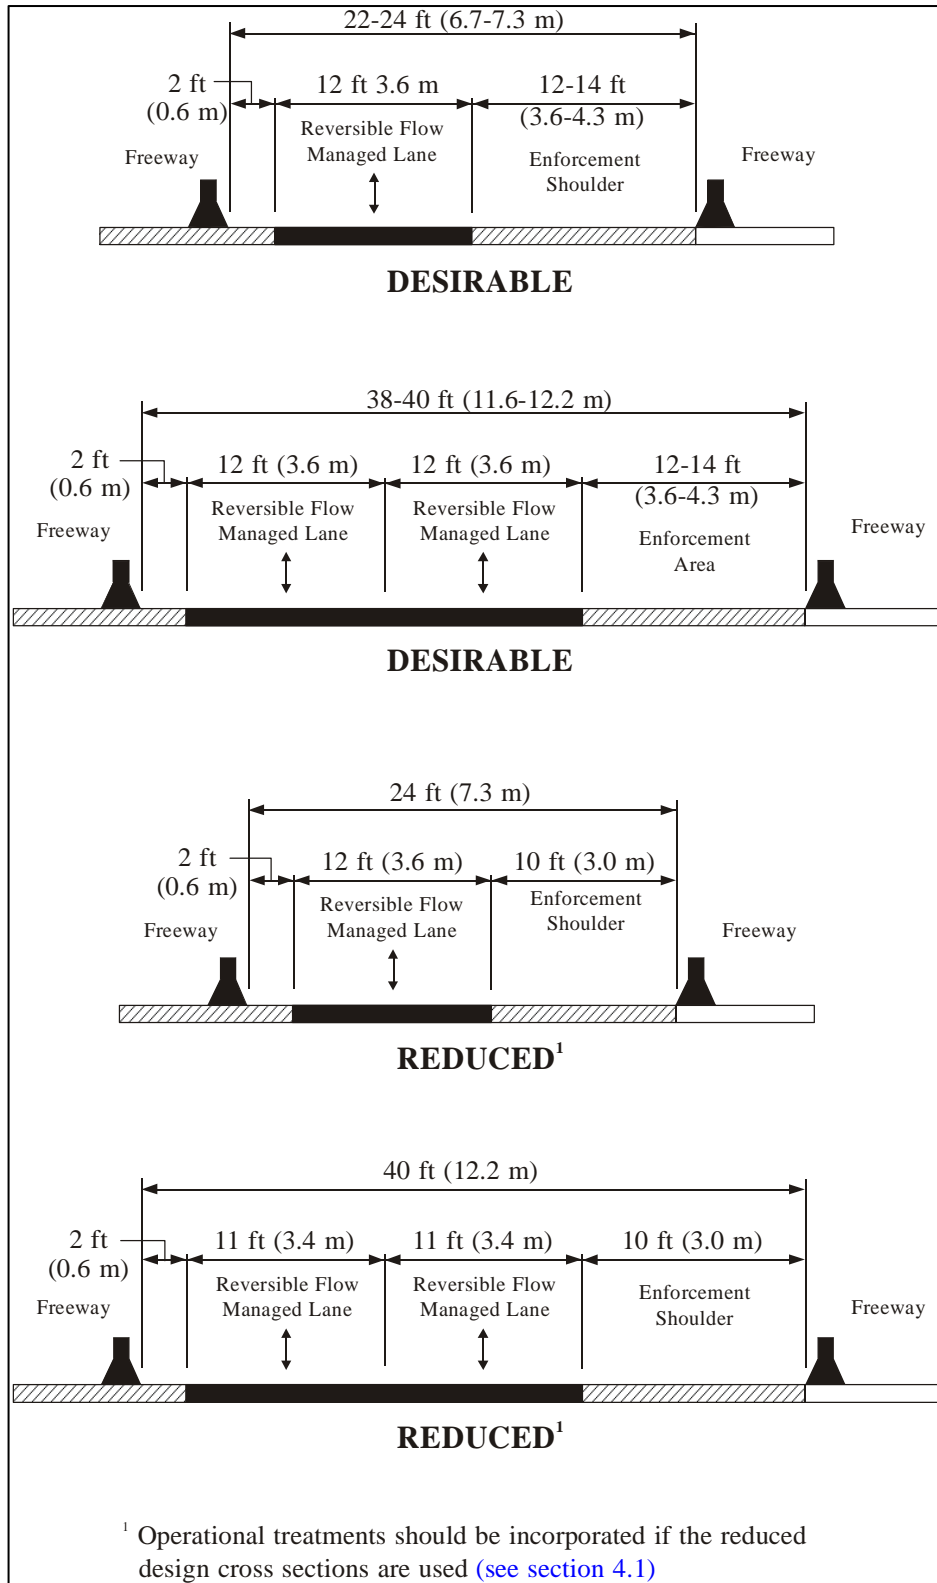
Examples of Cross Sections of Enforcement Areas along a Reversible Barrier-Separated Managed Lane (Adapted from Reference 4).
